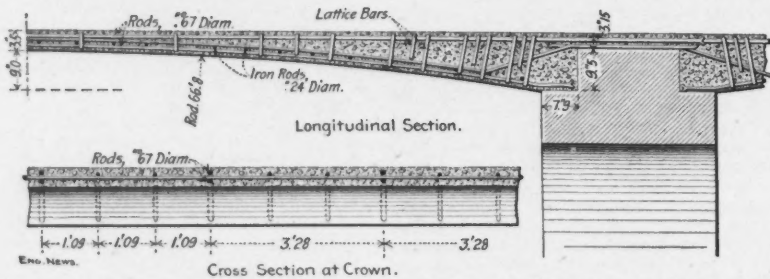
HENNEBIQUE ARCH SYSTEM OF STEEL AND CONCRETE FLOOR CONSTRUCTION FOR THE PETIT PALAIS DES BEAUX-ARTS FOR THE PARIS EXPOSITION OF 1900.
